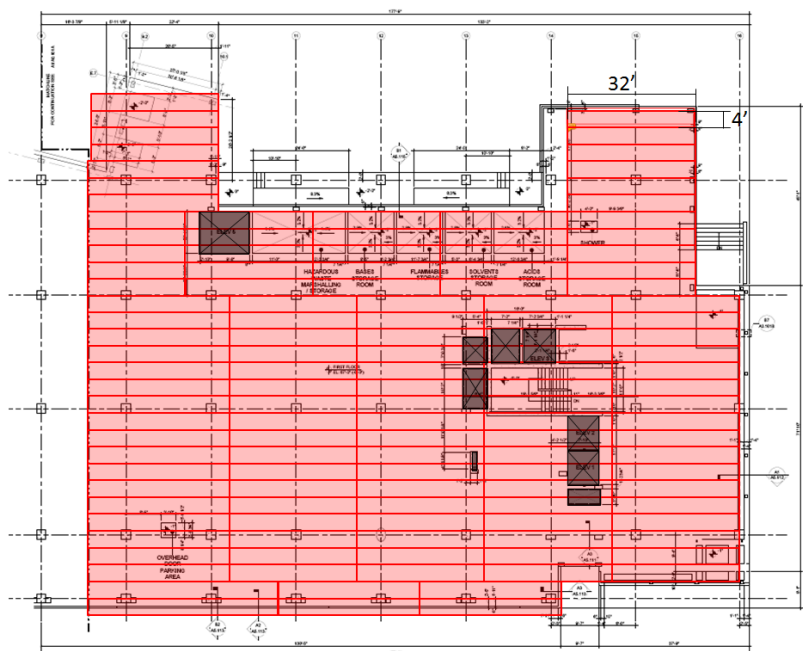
Hollow Core Plank Breakdown of First Floor West End (plans provided by HDR, Inc.)
